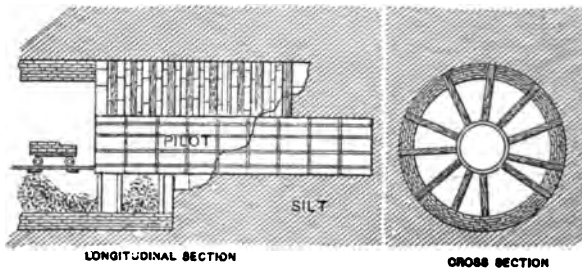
SECTIONS OF OLD TUNNEL, SHOWING THE PILOT.
